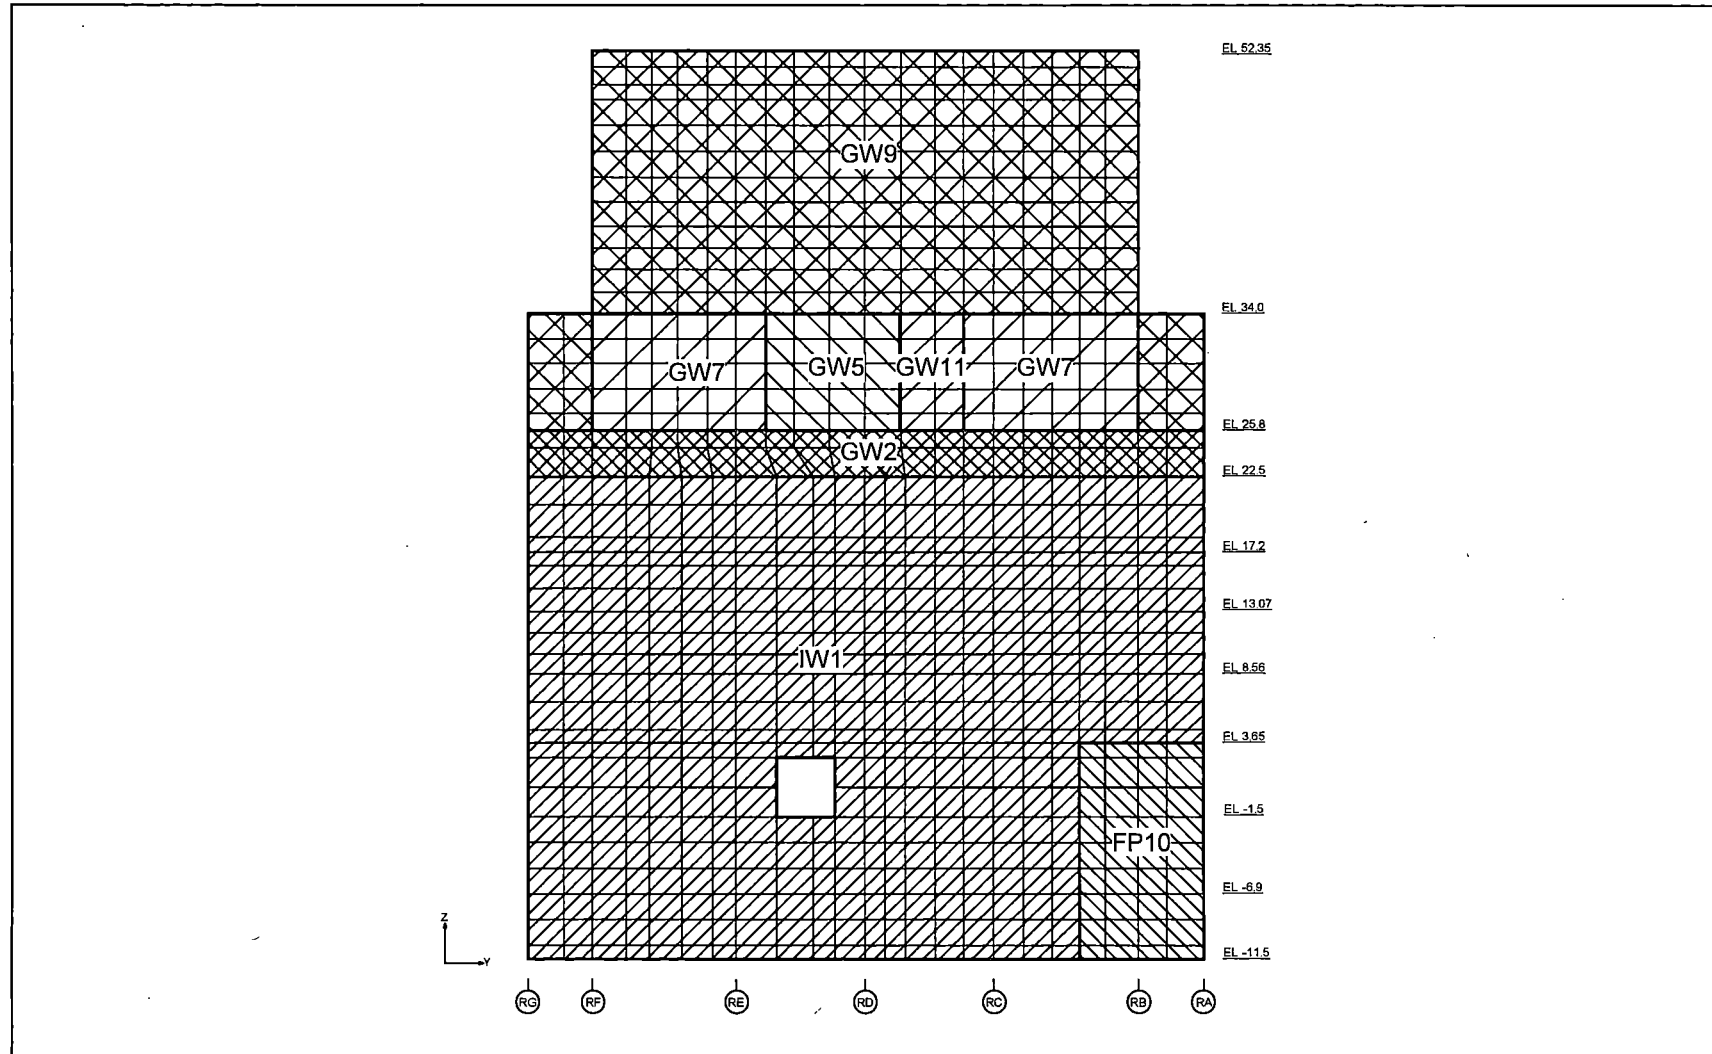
Application of Thermal Load on the External Wall (R7/F1)
